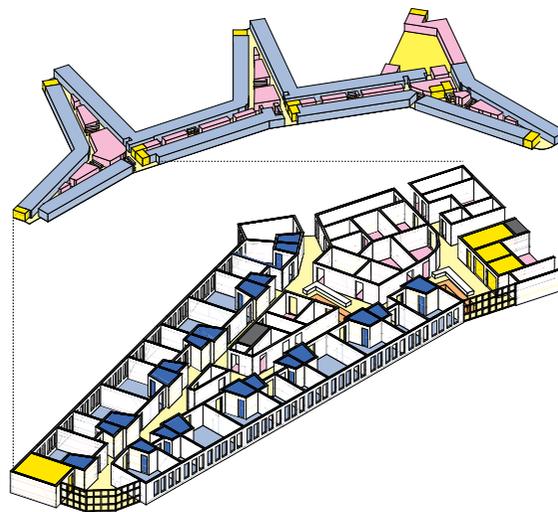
3D model of nursing departments on second floor with one sub-ward.
